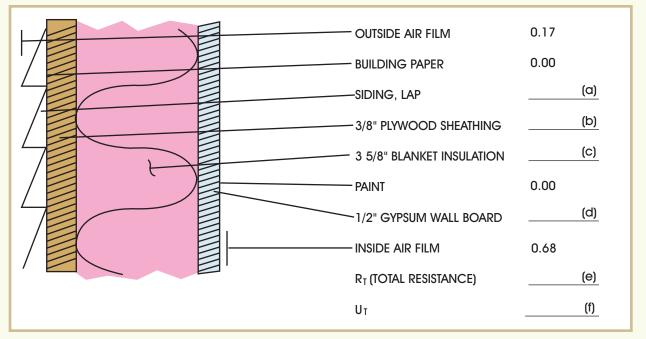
This is a cross-sectional view of the home's exterior wall.
